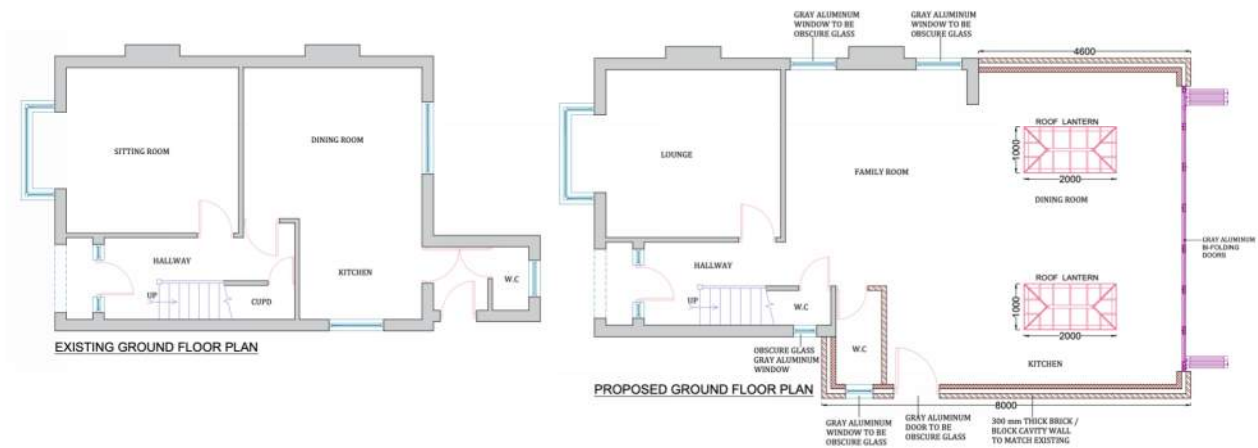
EXISTING BUILDING & PROPOSED EXTENSION
